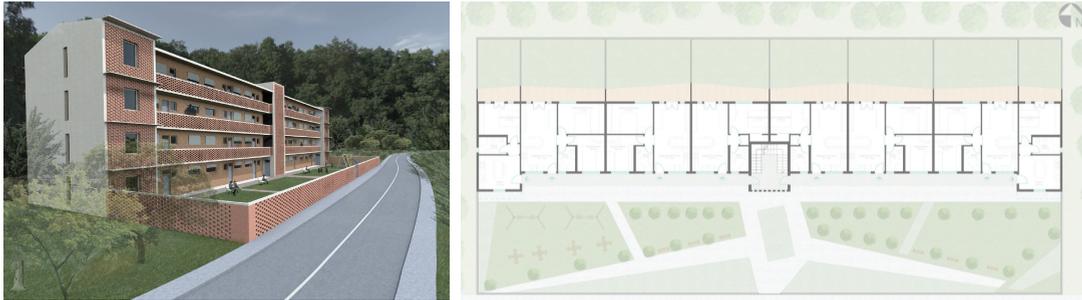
Rendered view of the designed low-rise residential building and typical floor layout
